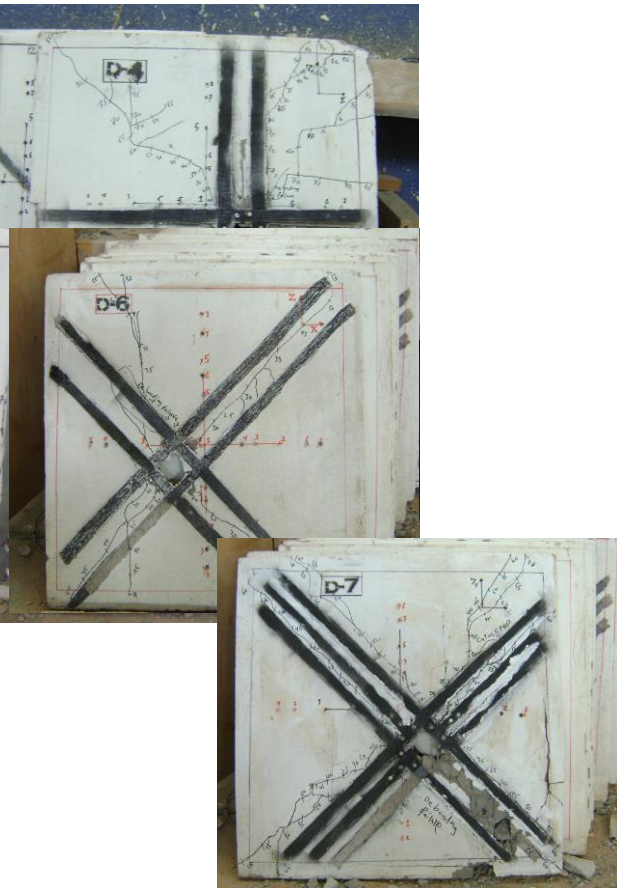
Crack pattern after failure for series (D) slab specimen.
